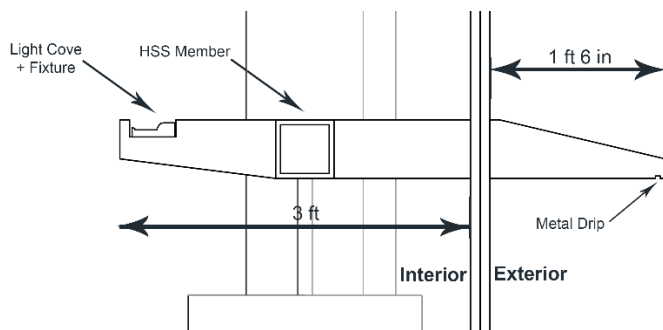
Section Detail of the Light Shelf and Cove Fixture
